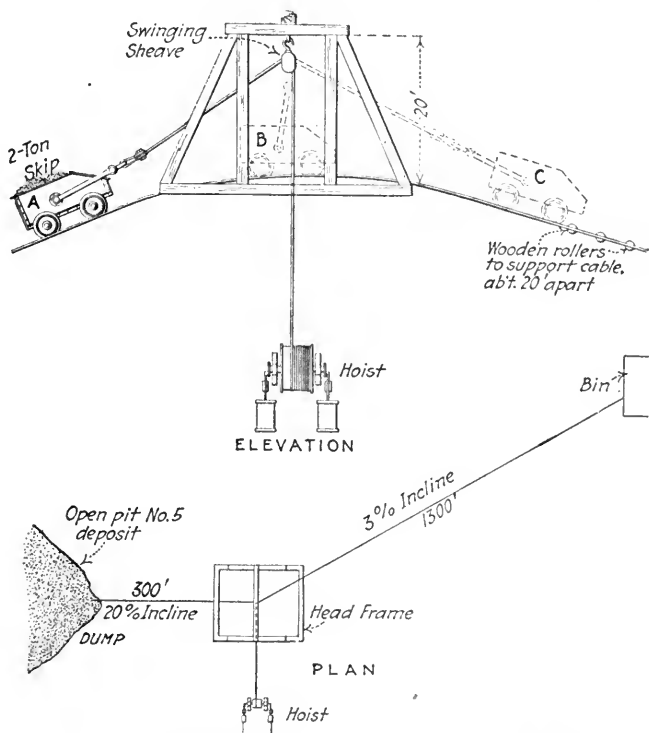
ARRANGEMENT FOR HOISTING AND LOWERING.
